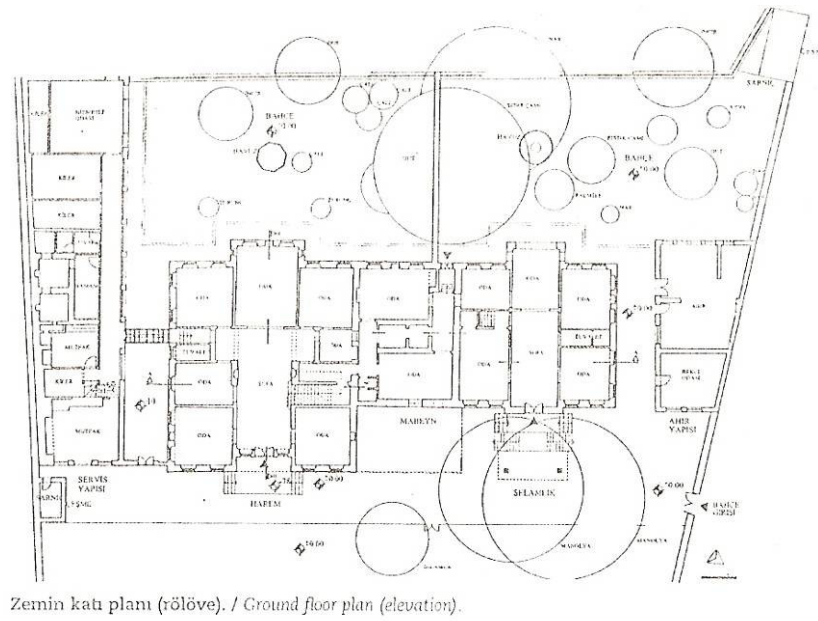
The ground floor plan of Yahya Paşa House in Bayraklı.
